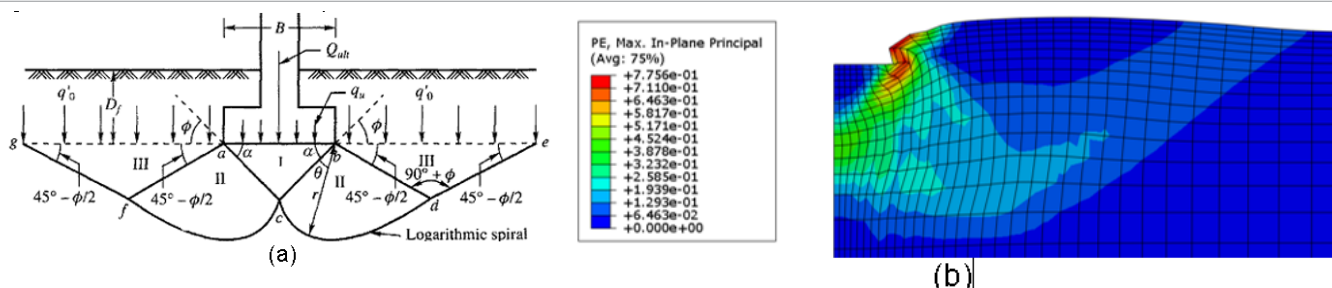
(a) General Shear failure of a strip footing: Terzaghi's assumption (b) Plastic shear distribution of strip footing at failure
